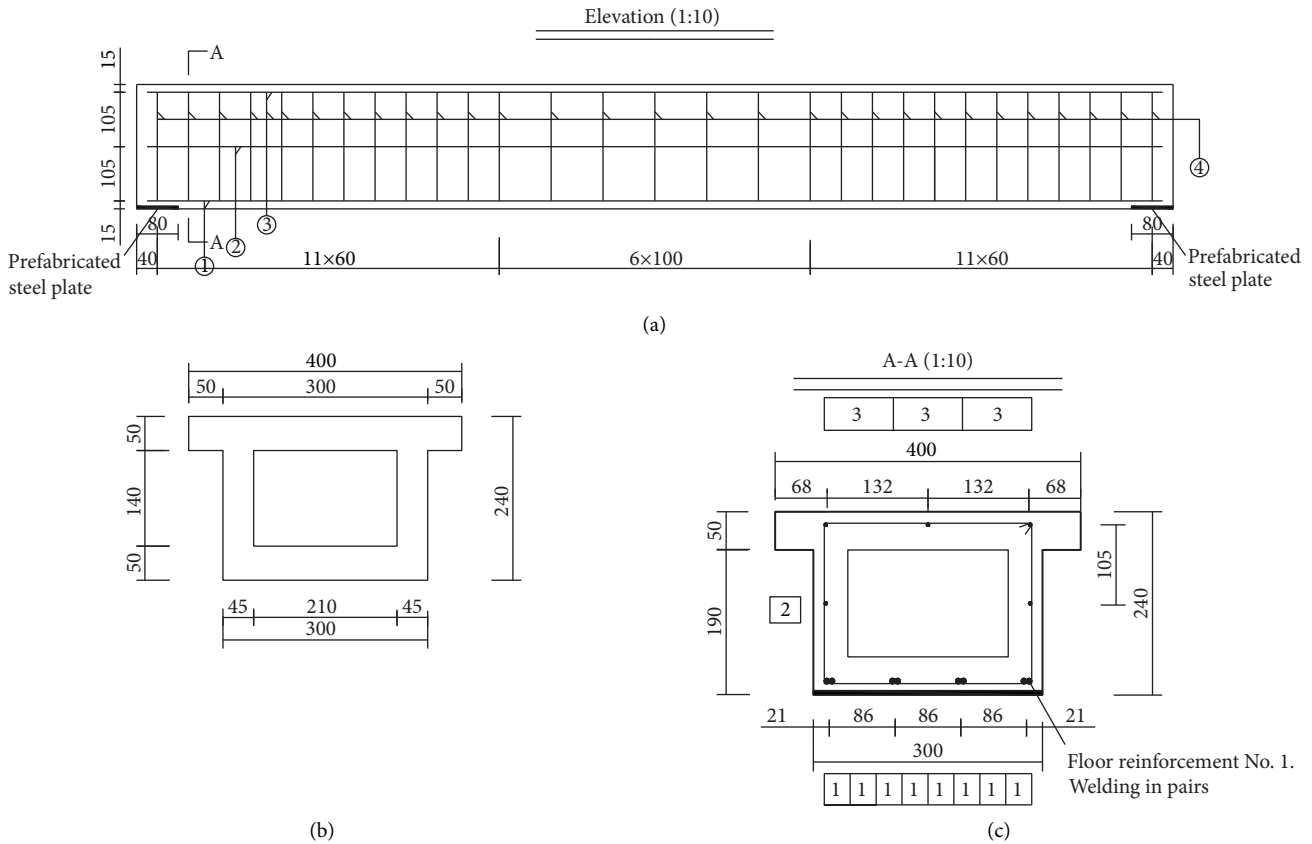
Section size and reinforcement arrangement of test beam (unit: mm). (a) Elevation. (b) Section. (c) Reinforcement layout.
